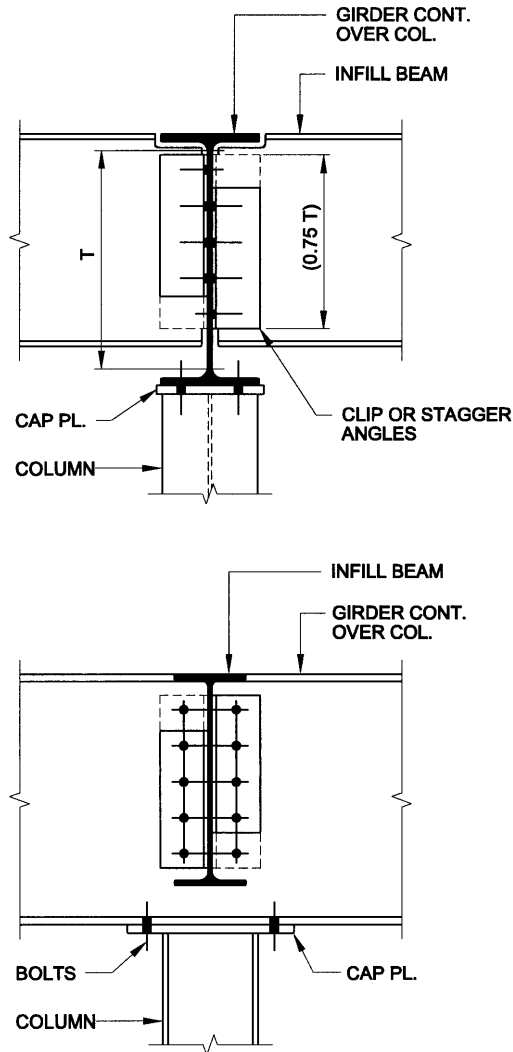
Beam framing continuously over column top, stability provided with connections of infill beams.
